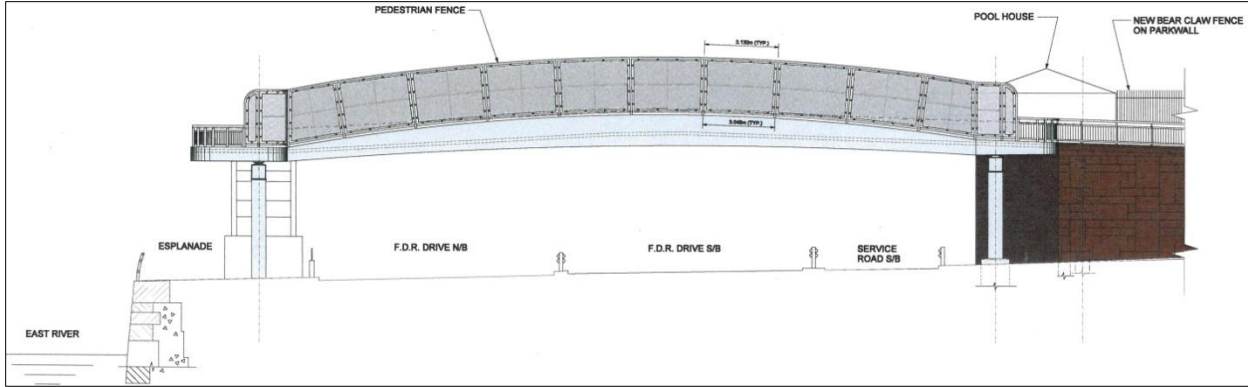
The north elevation of the bridge with a safety fence and beginning of the west ramp.
